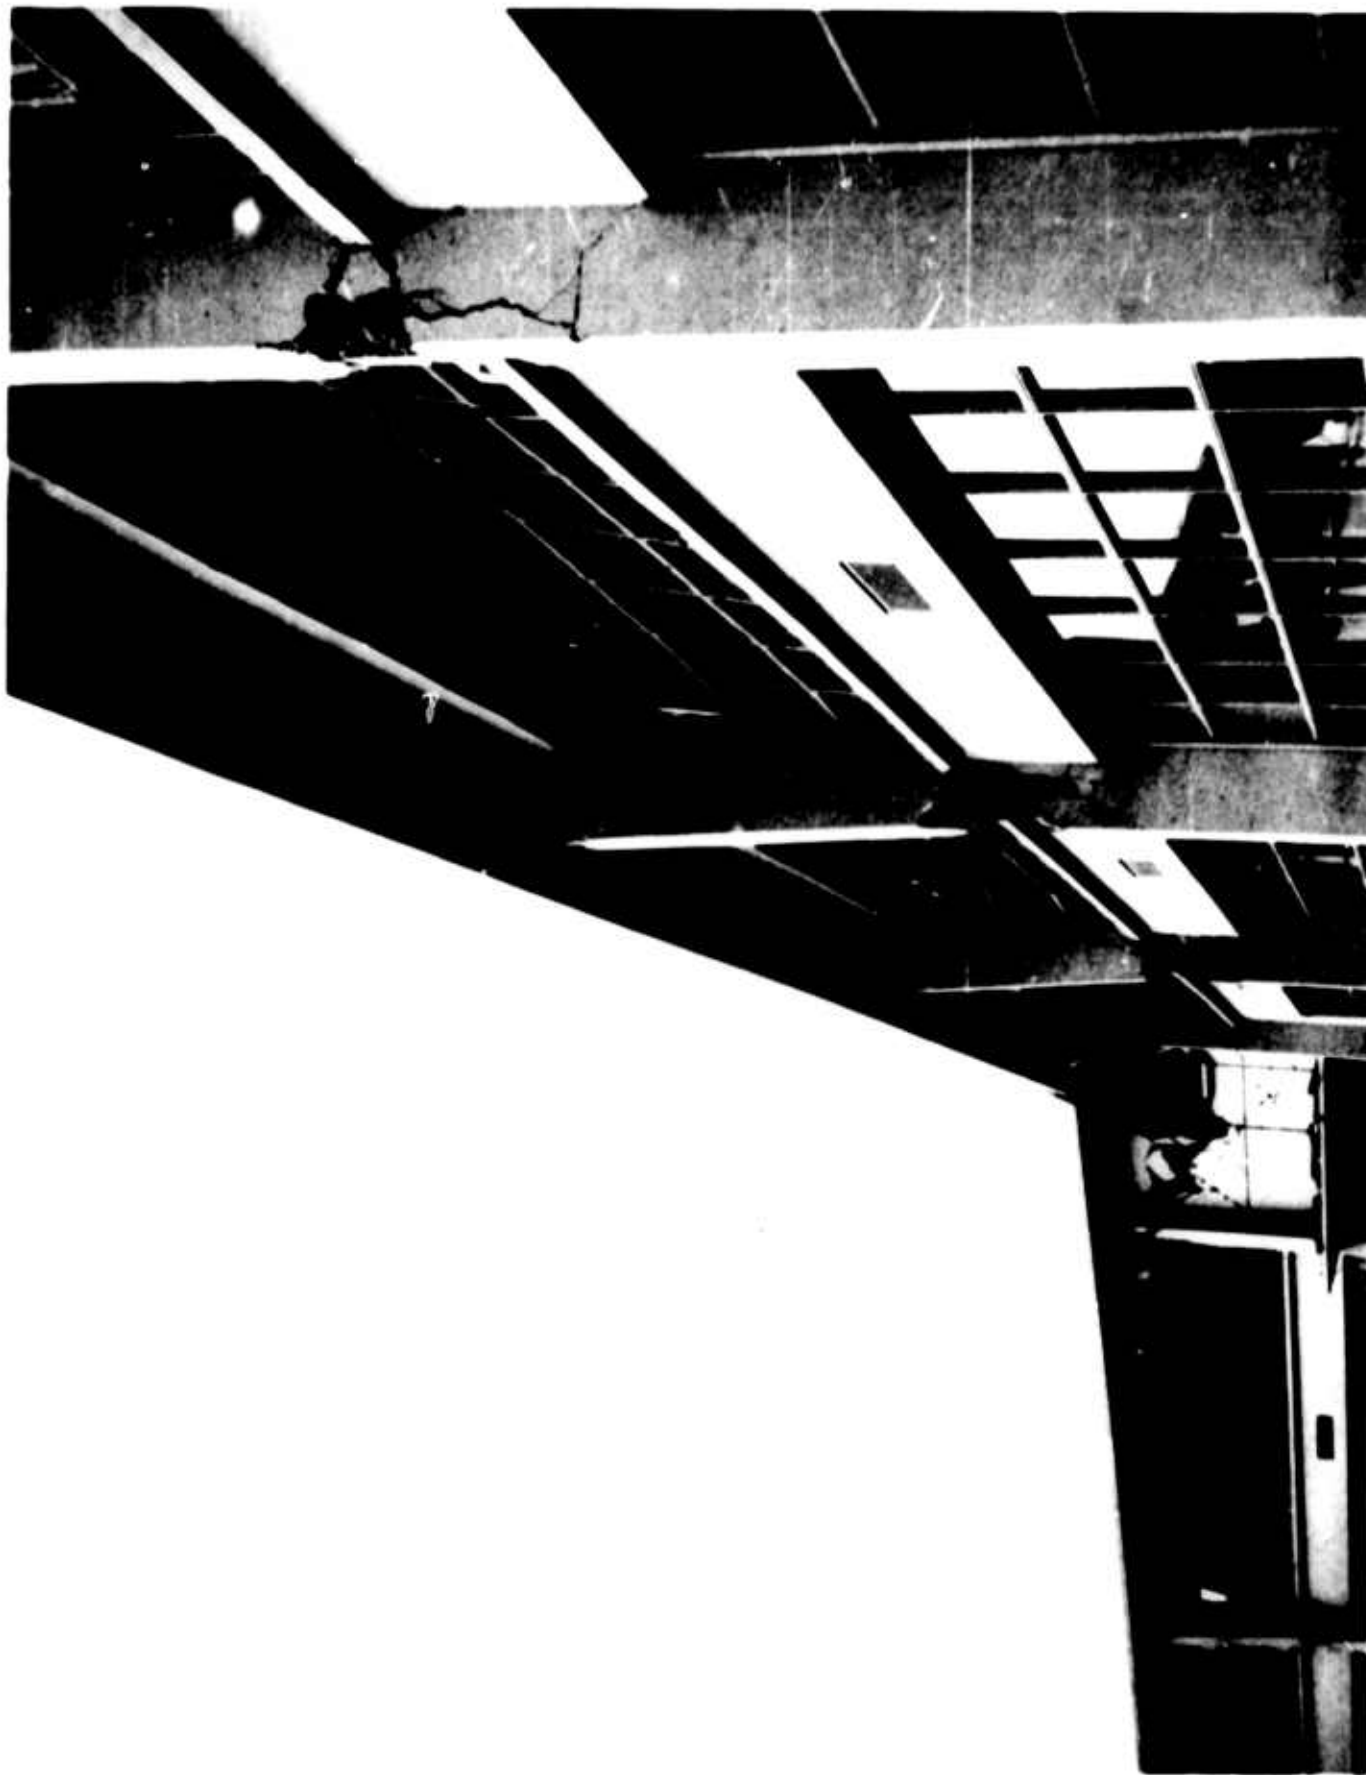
West Anchorage High School (Damage to second-story columns in west wall of wing A near intersection of wings A and B showing consistently poor column construction joints)
